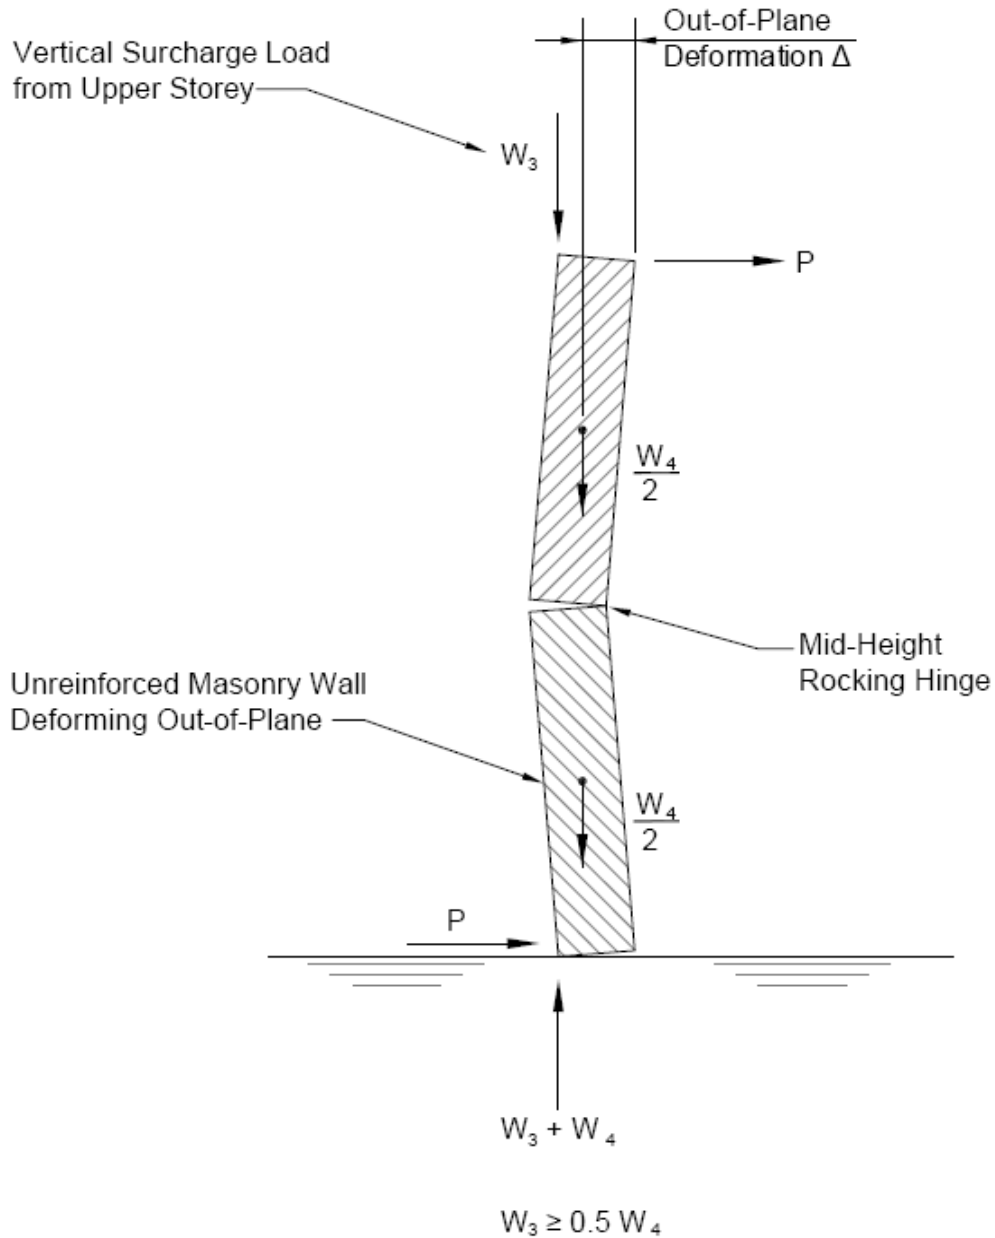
Confined Unreinforced Concrete Masonry Wall
